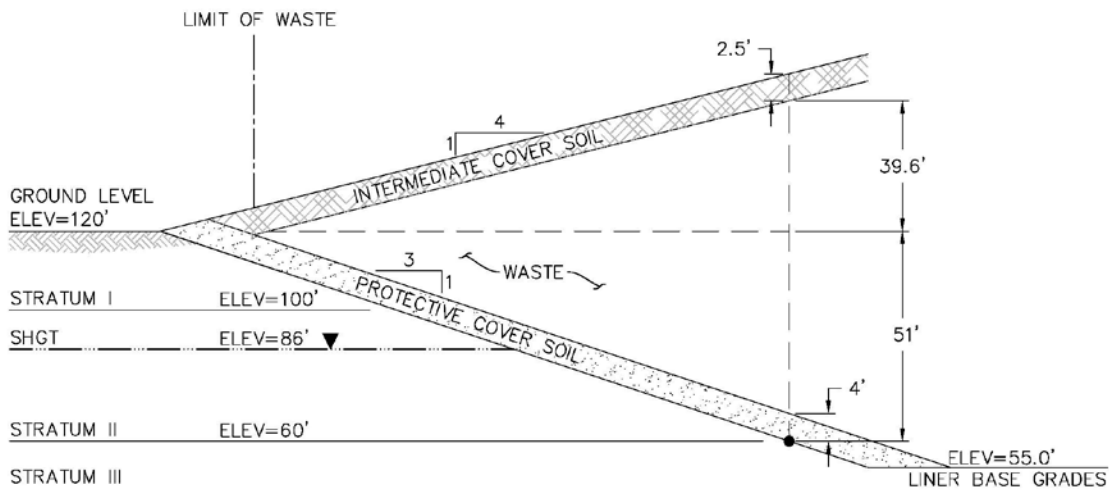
D.4.2-3: Typical/Idealized Cross-Section
